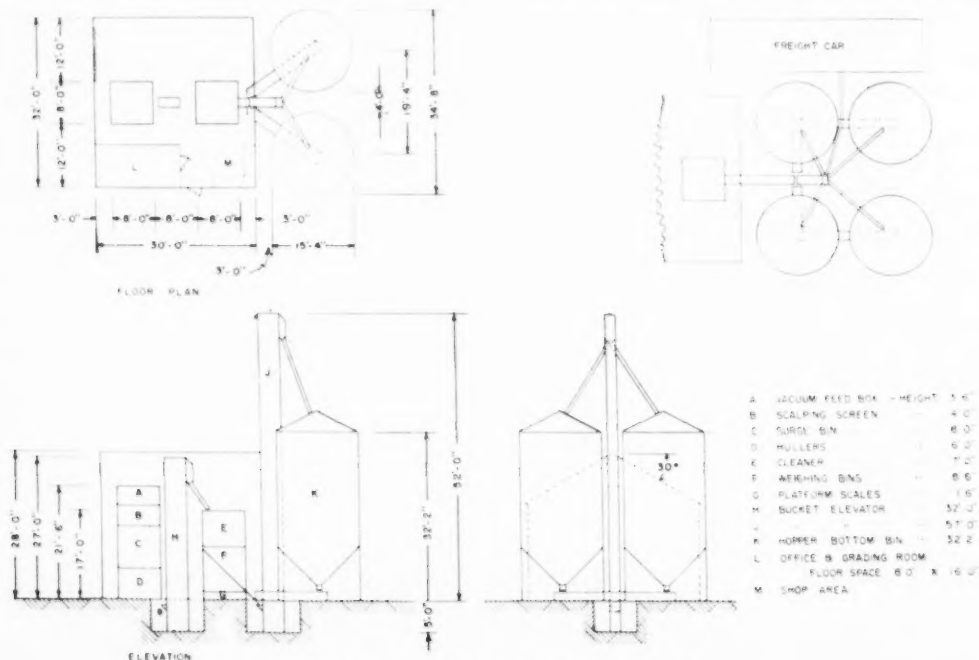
Schematic drawing of proposed castor bean hulling plant
